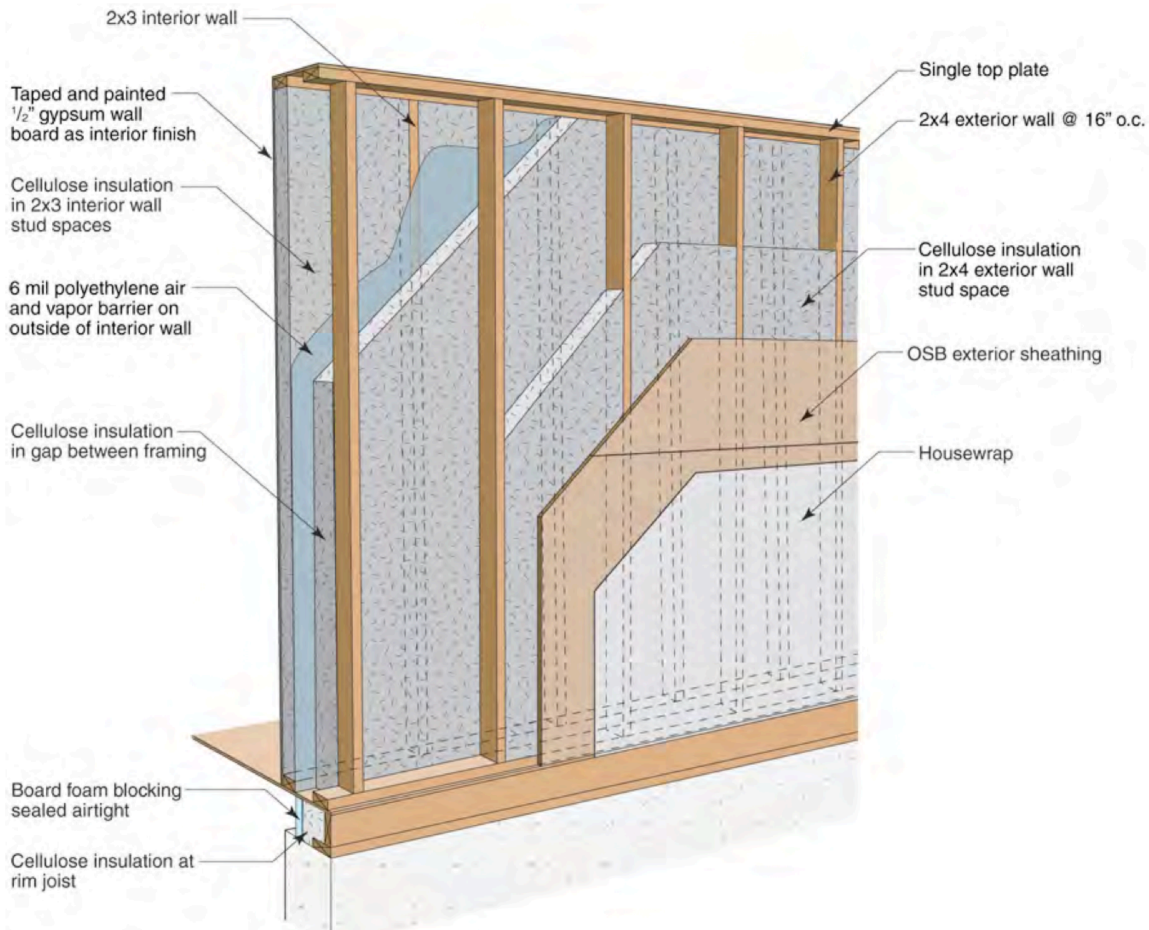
Double-stud wall construction (Straube and Smegal 2009).
